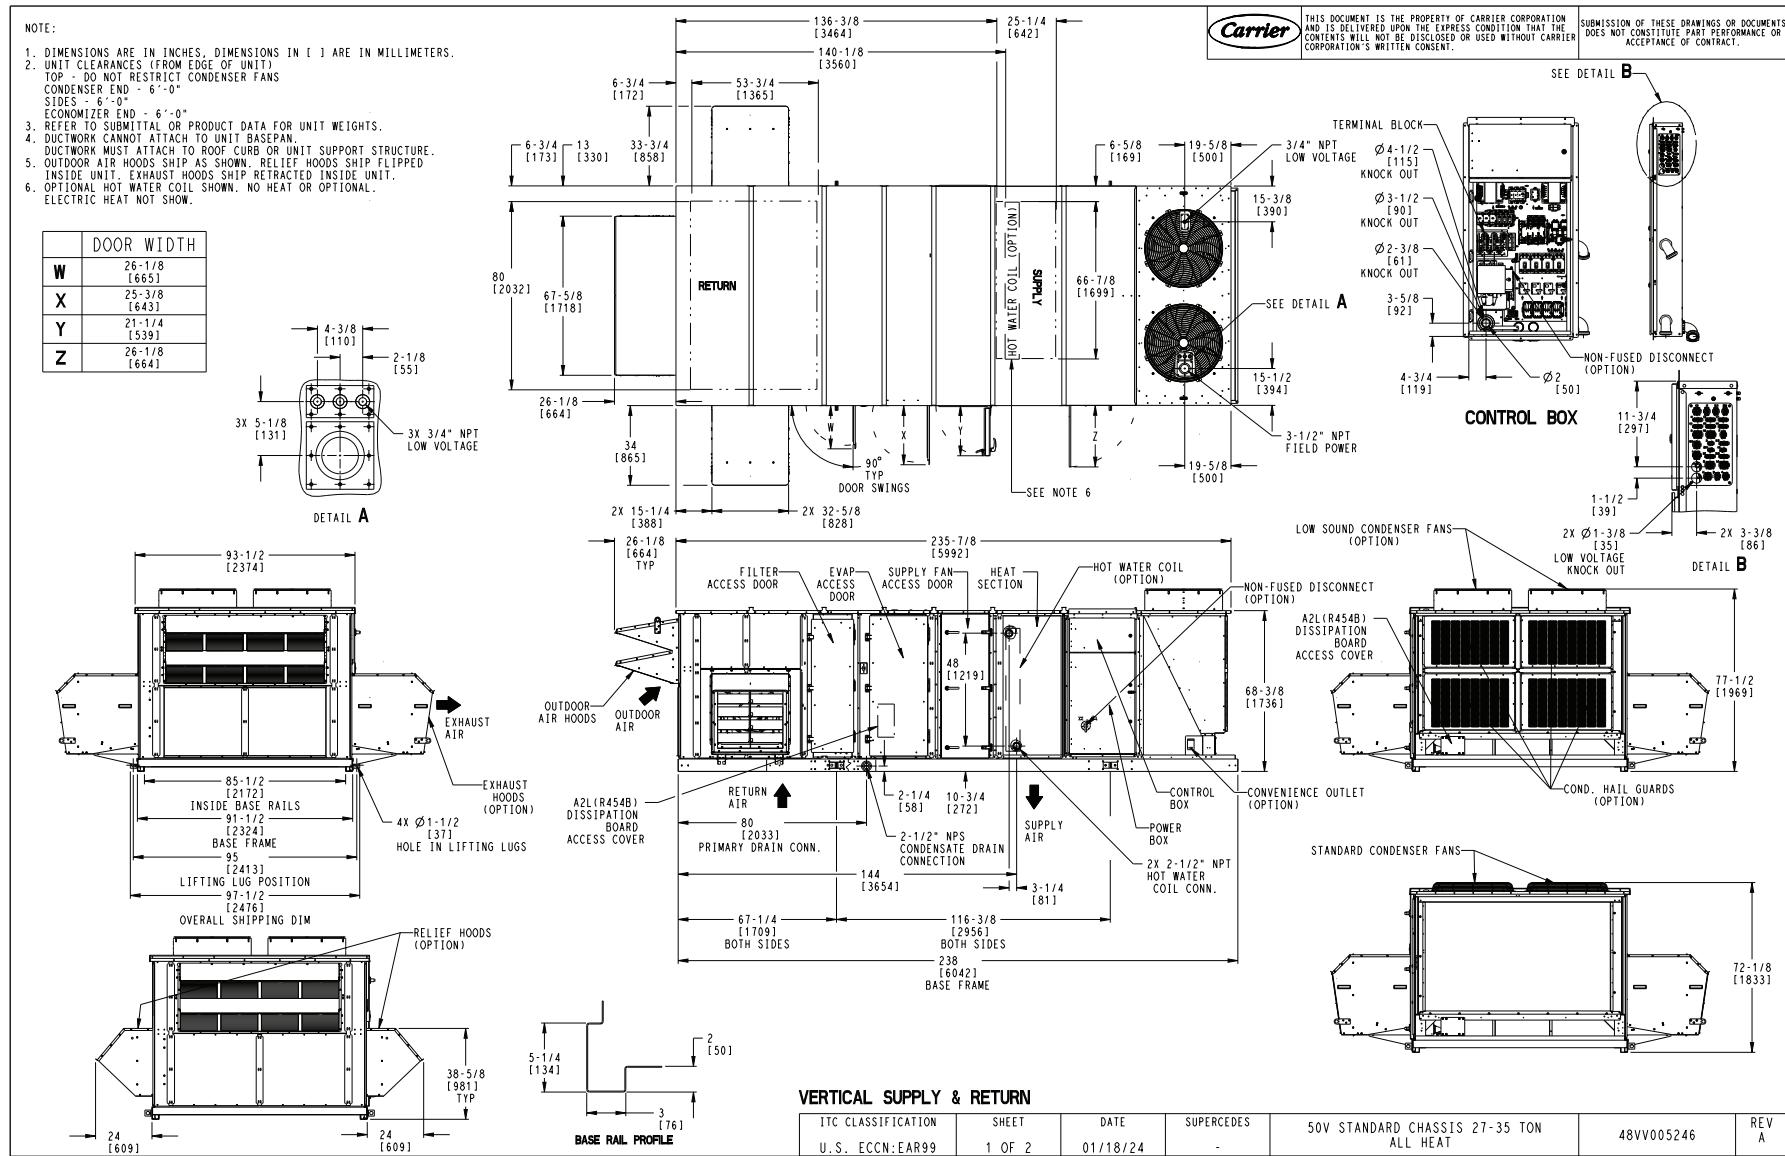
50V 27.5-35 Ton Standard Chassis
